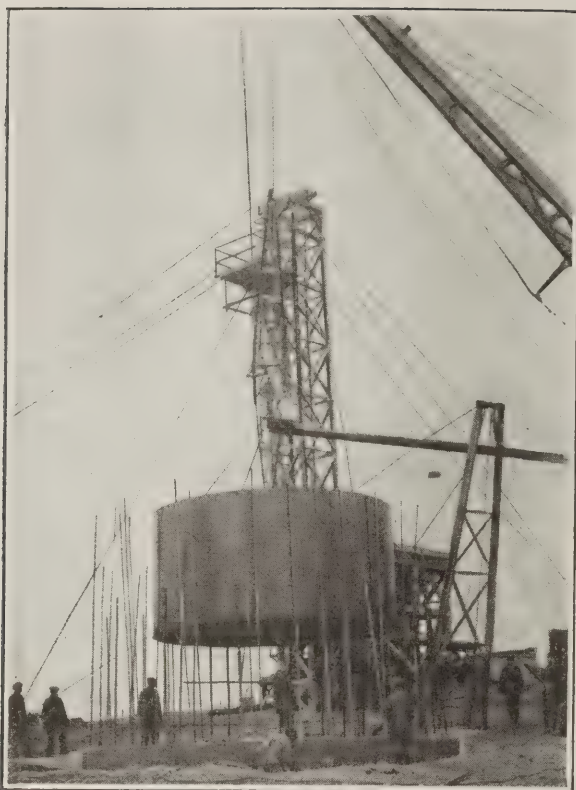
PLACING INSIDE FORM AT AUXILIARY SHAFT
